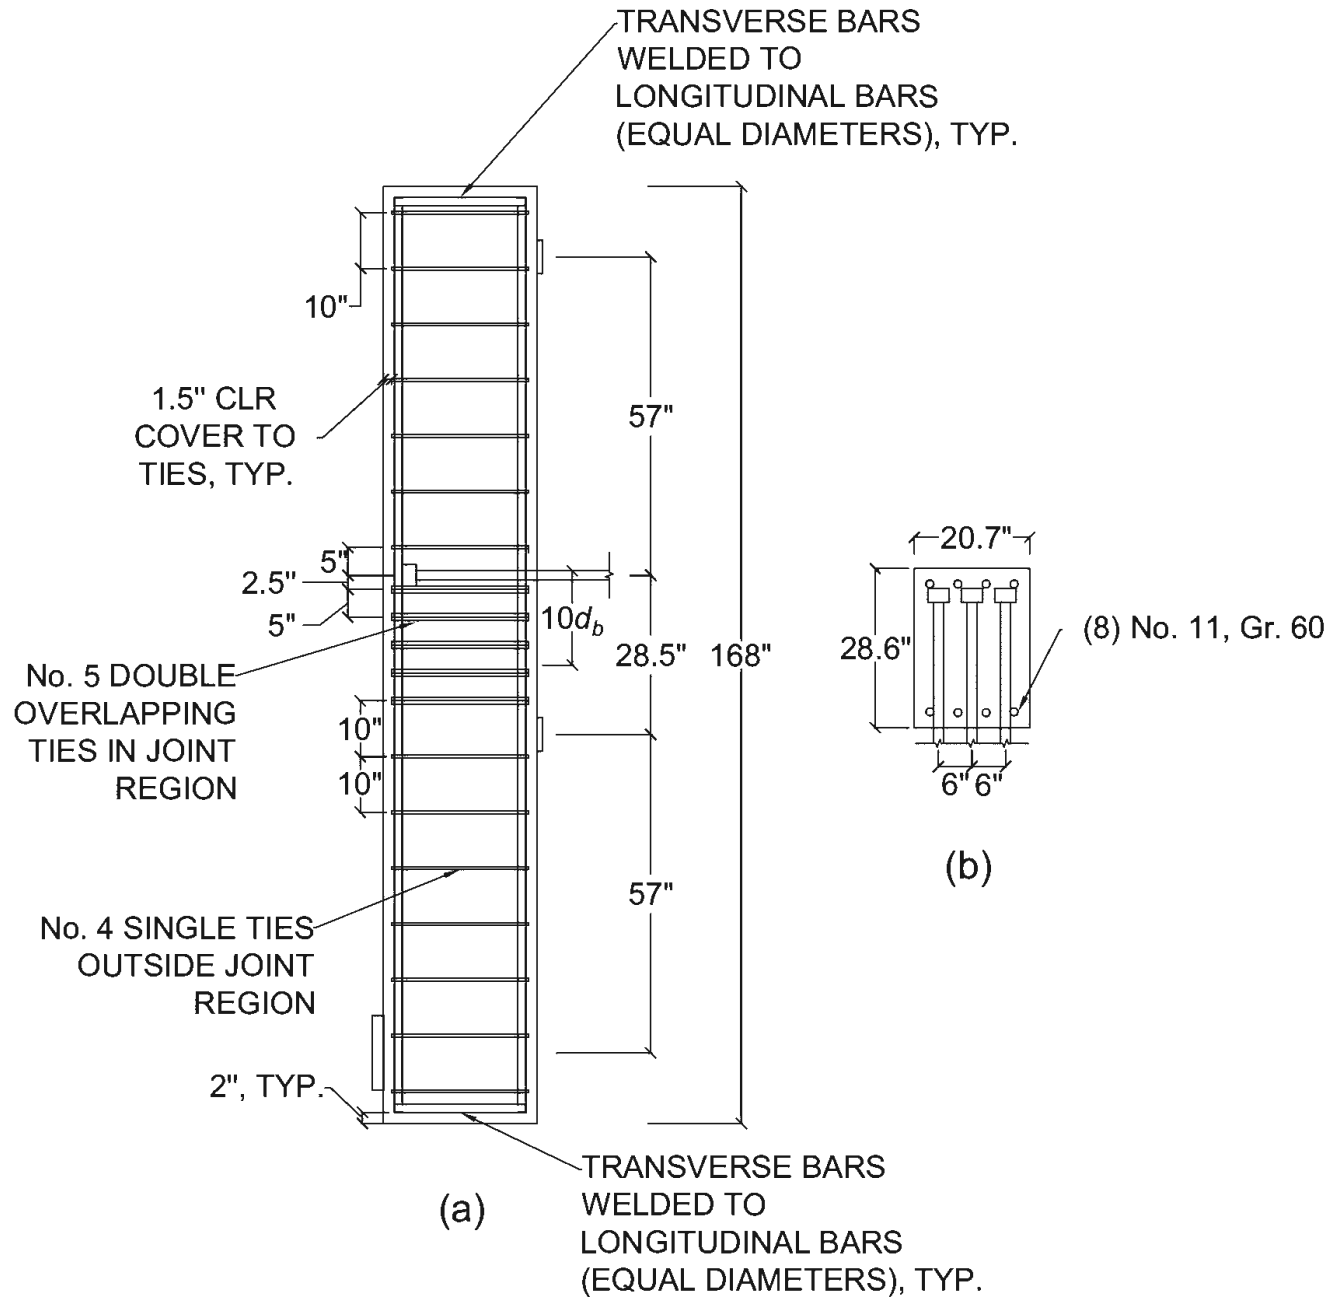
Details of reinforcement layout for No. 14 headed bar specimen 14-10: (a) elevation, (b) cross-section
